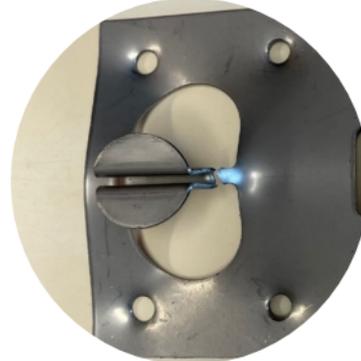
Type of CRM.04 skin element fixing rupture – horizontal load (wind)
